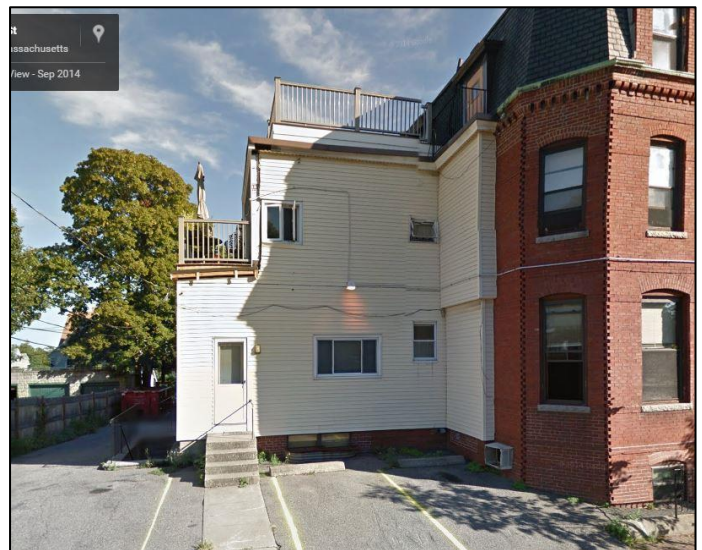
Image from 2014 shows the construction of one of the unpermitted roof decks.
